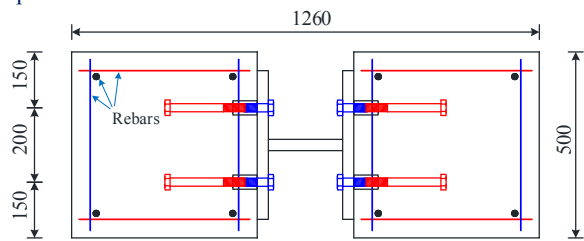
Configurations and dimensions of push-out specimens (Unit: mm).
